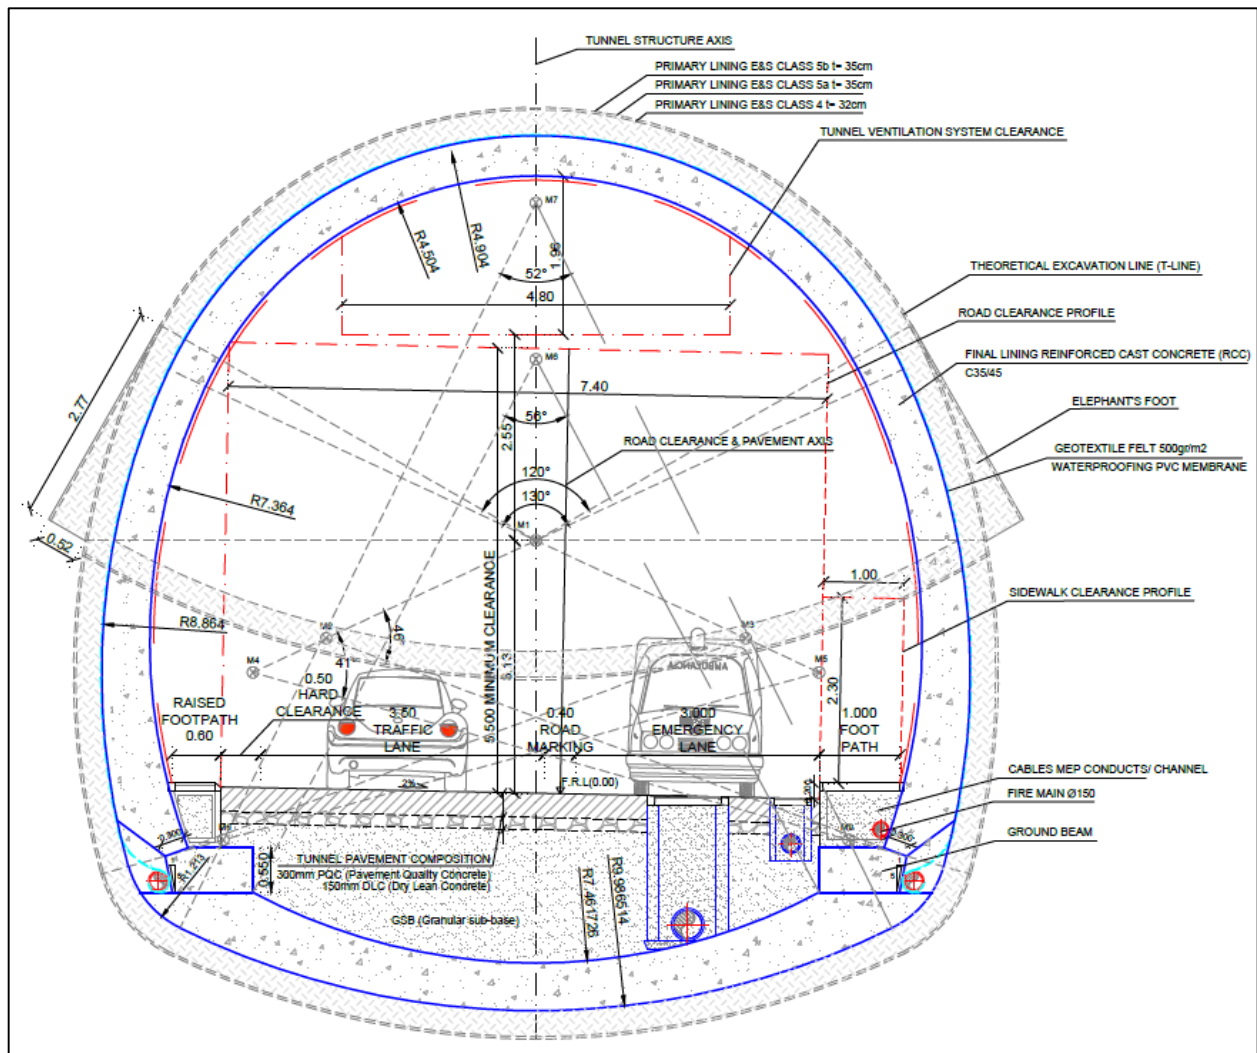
Uni-Directional Tunnel Cross Section with Invert
